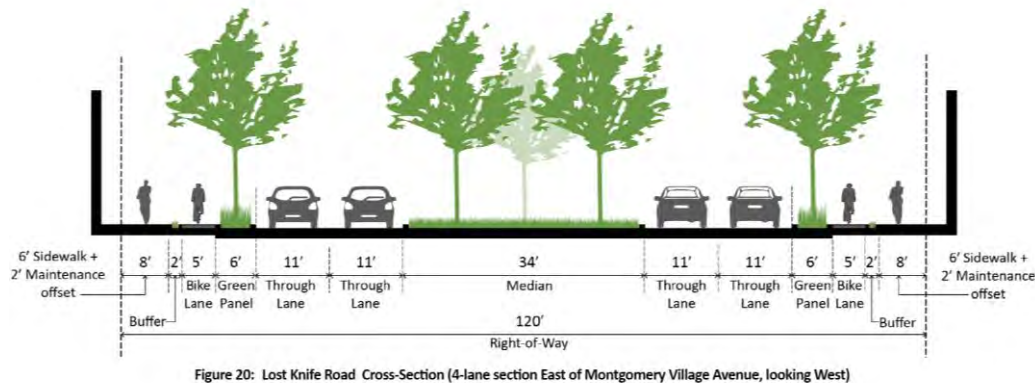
Lost Knife Road Cross-Section (4-lane section East of Montgomery Village Avenue, looking West)
